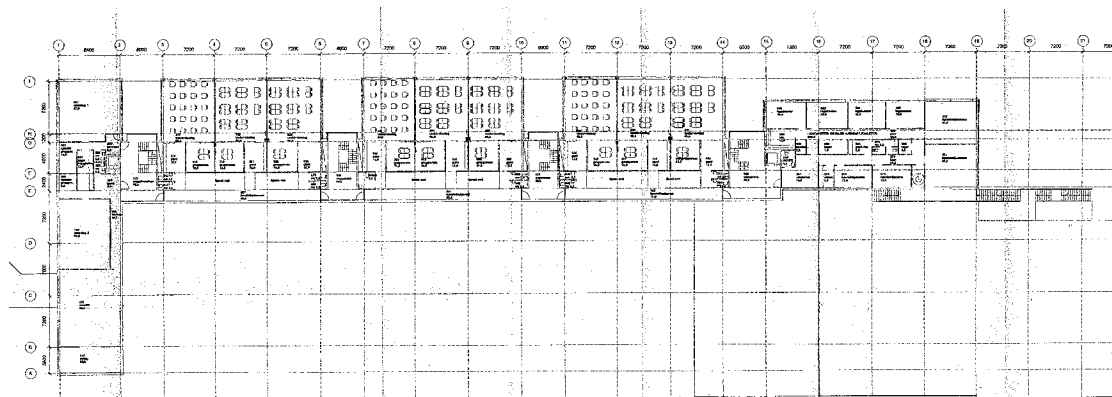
Horizontal cross-section showing the 3rd floor.
